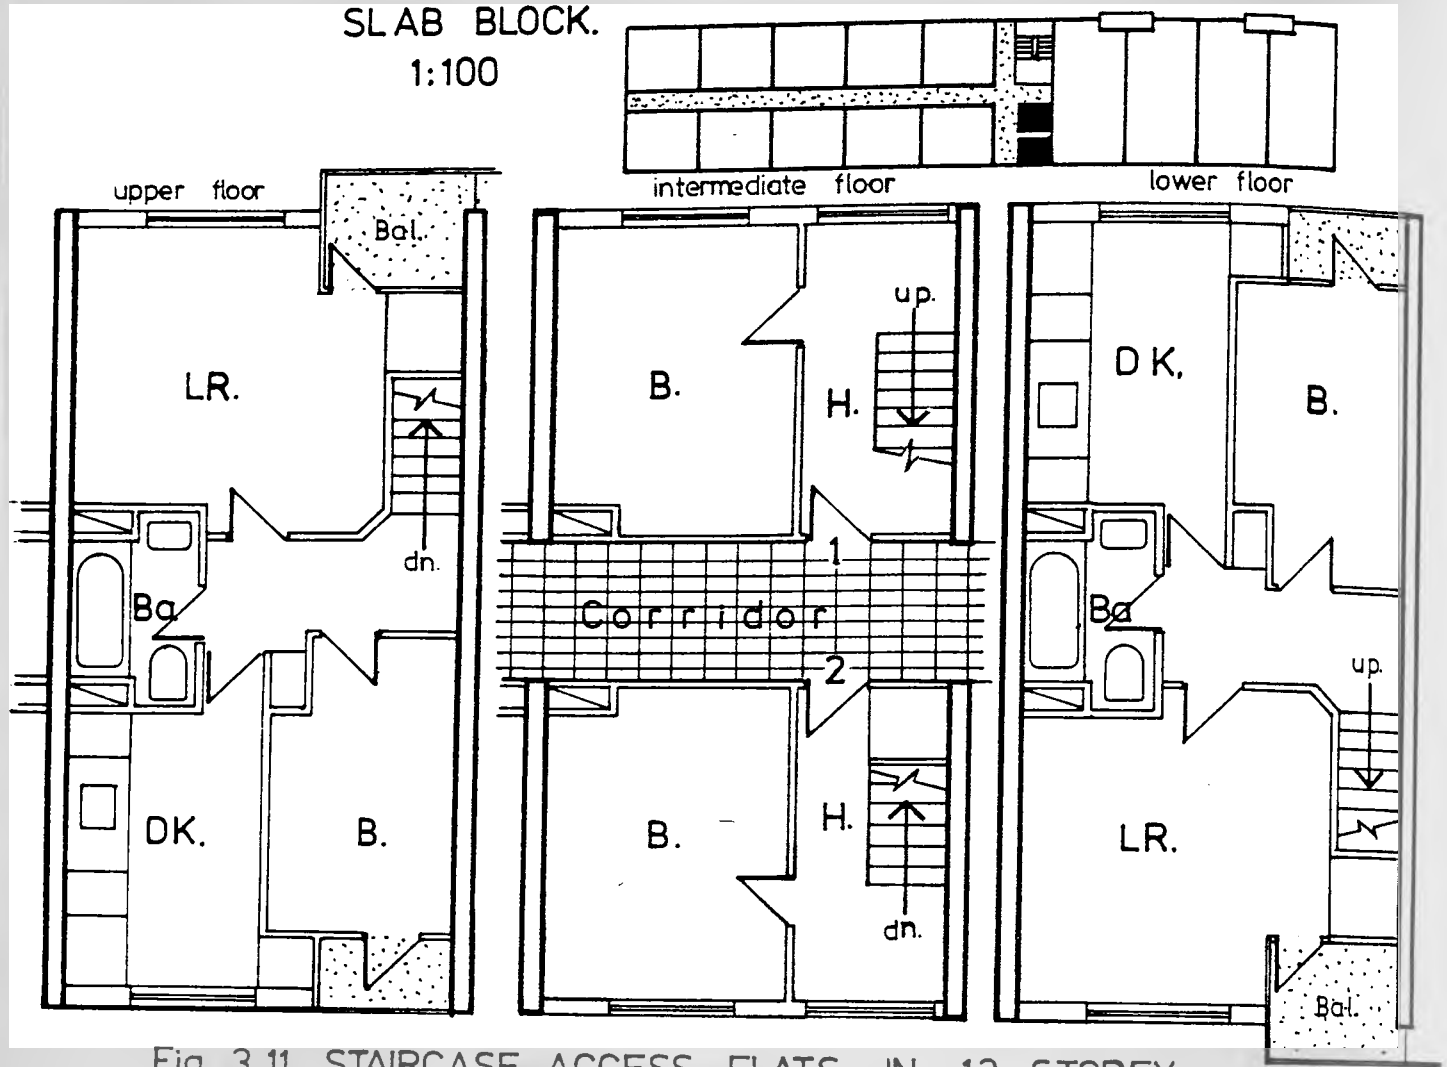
STAIRCASE ACCESS FLATS IN 12 STOREY SLAB BLOCK. 1:100. 4-PERSON DWELLINGS.
